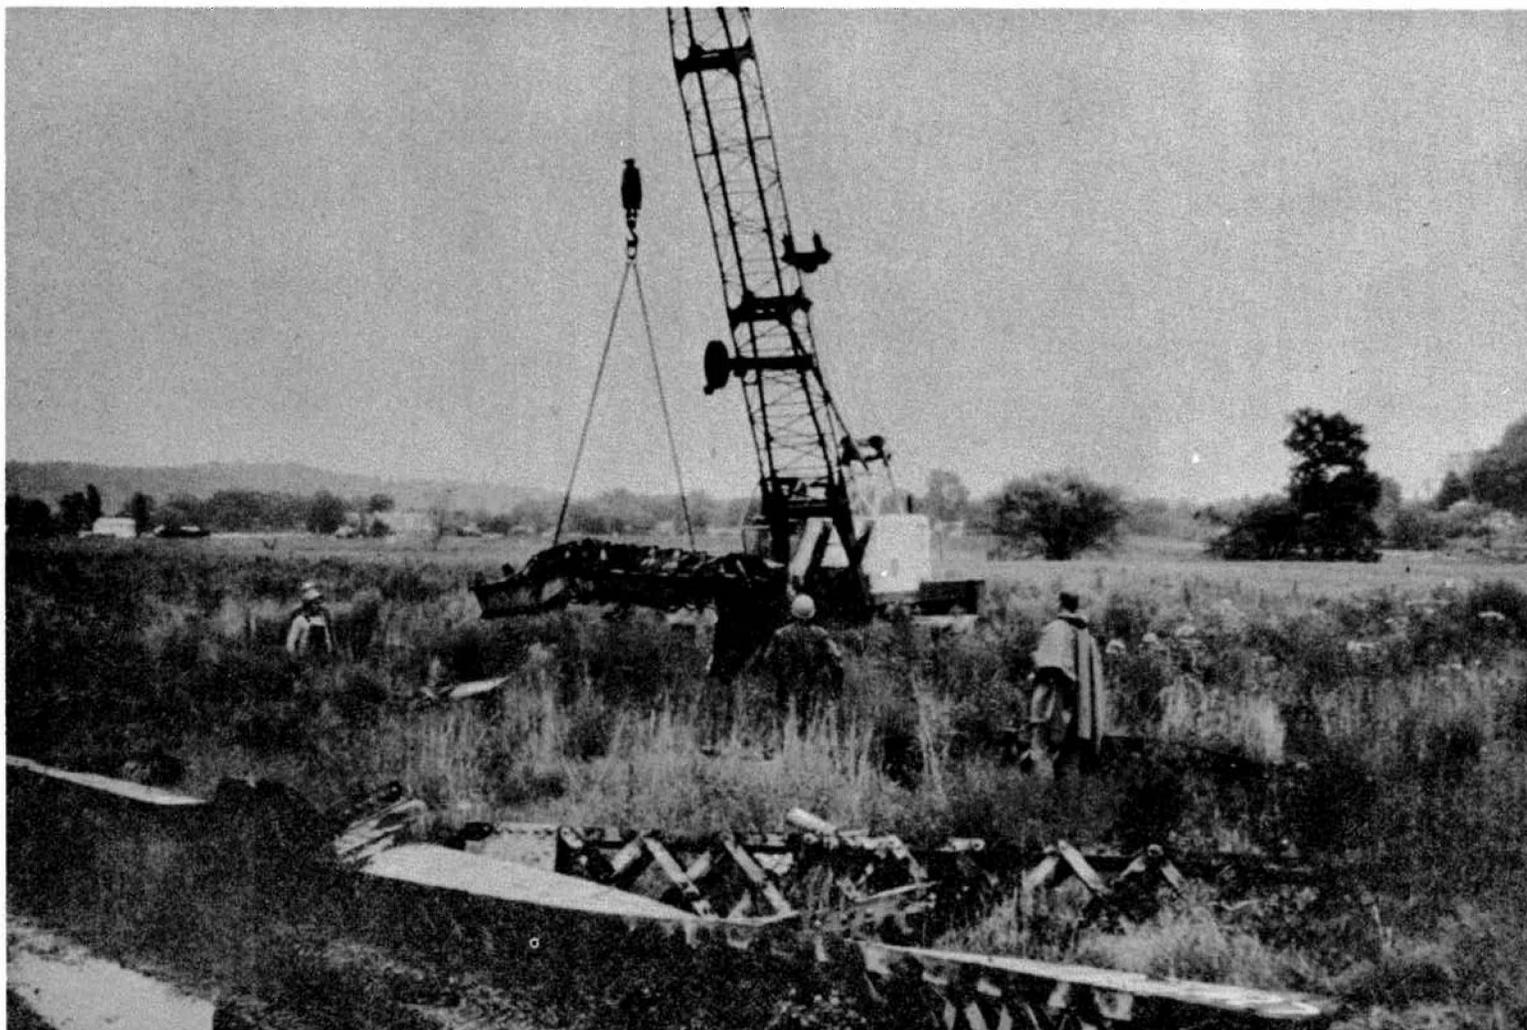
Crane engaged in reassembly operations; positioning a fractured member in its proper position.
